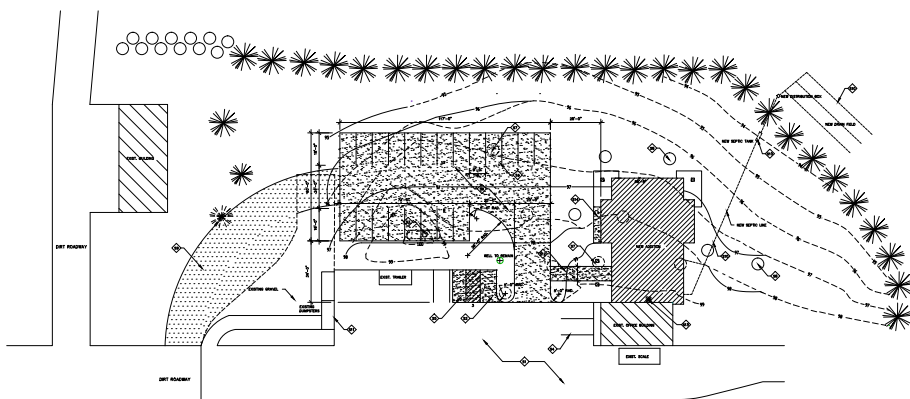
LONI Site Plan. From Waggoner and Wineinger Architects.
